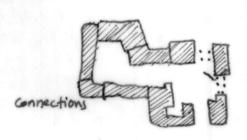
Connected buildings-plan form (Source: Alexander C. 1977: 534)
